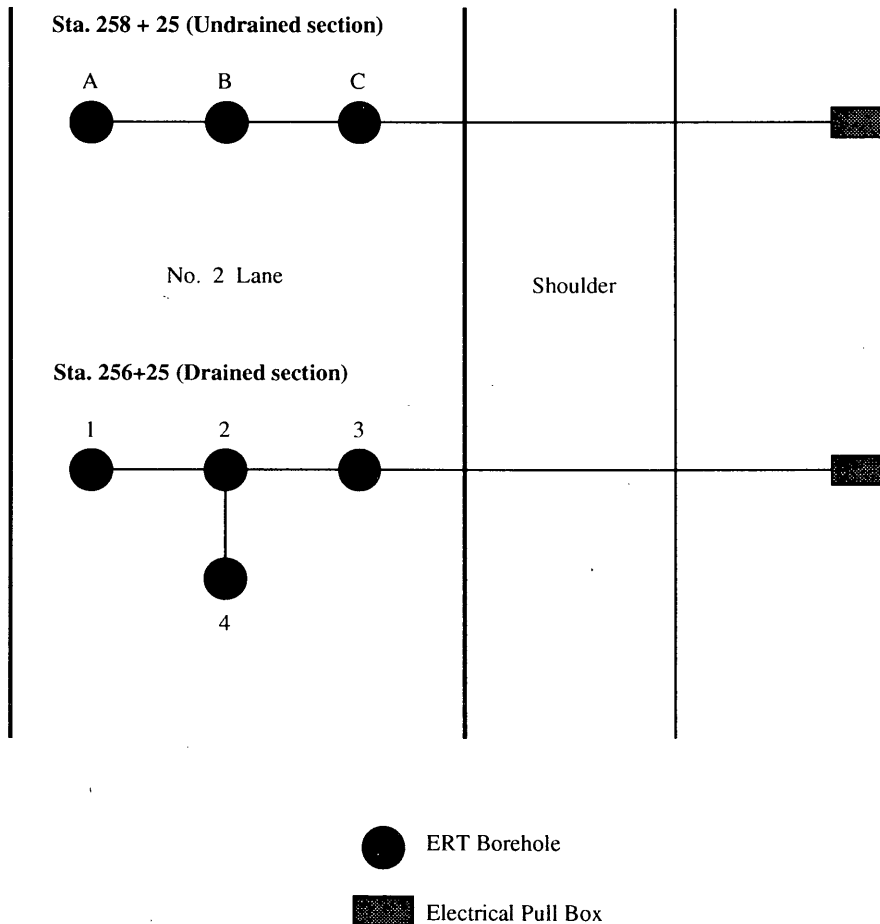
ERT layout at Experiment 1 site (note drawn to scale).
